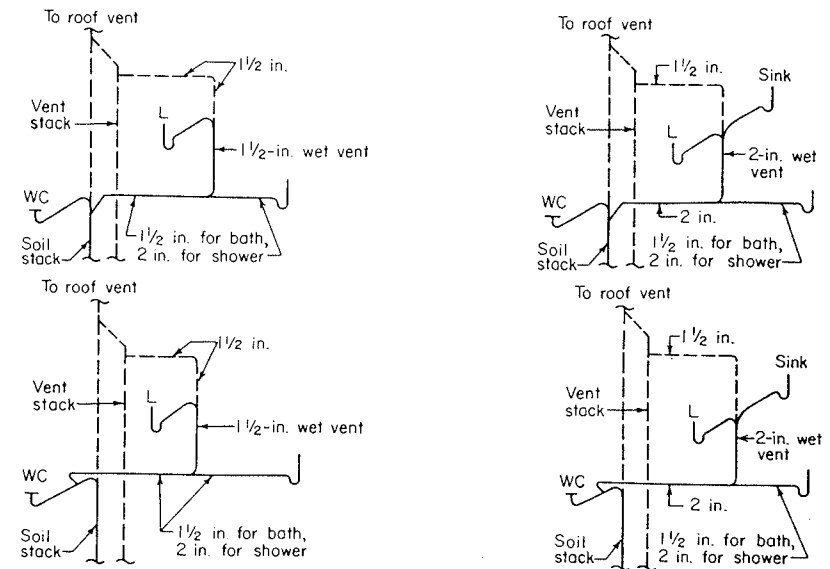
Wet-vented single bathroom and kitchen fixture group on a stack or at top floor of a stack serving multistory bathroom groups.
